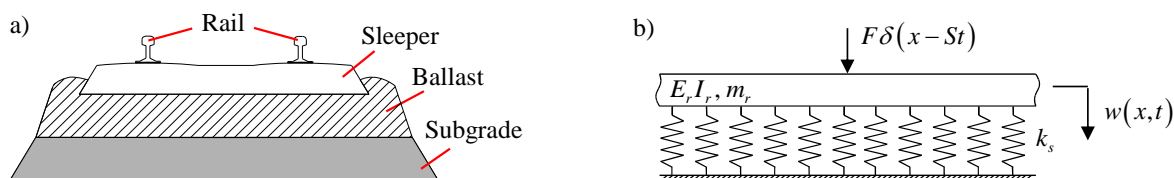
(a) example of the rail track structure; and (b) A simplified model of the track structure consisting of an Euler-Bernoulli infinite beam on a Winkler foundation subject to a concentrated moving load.
